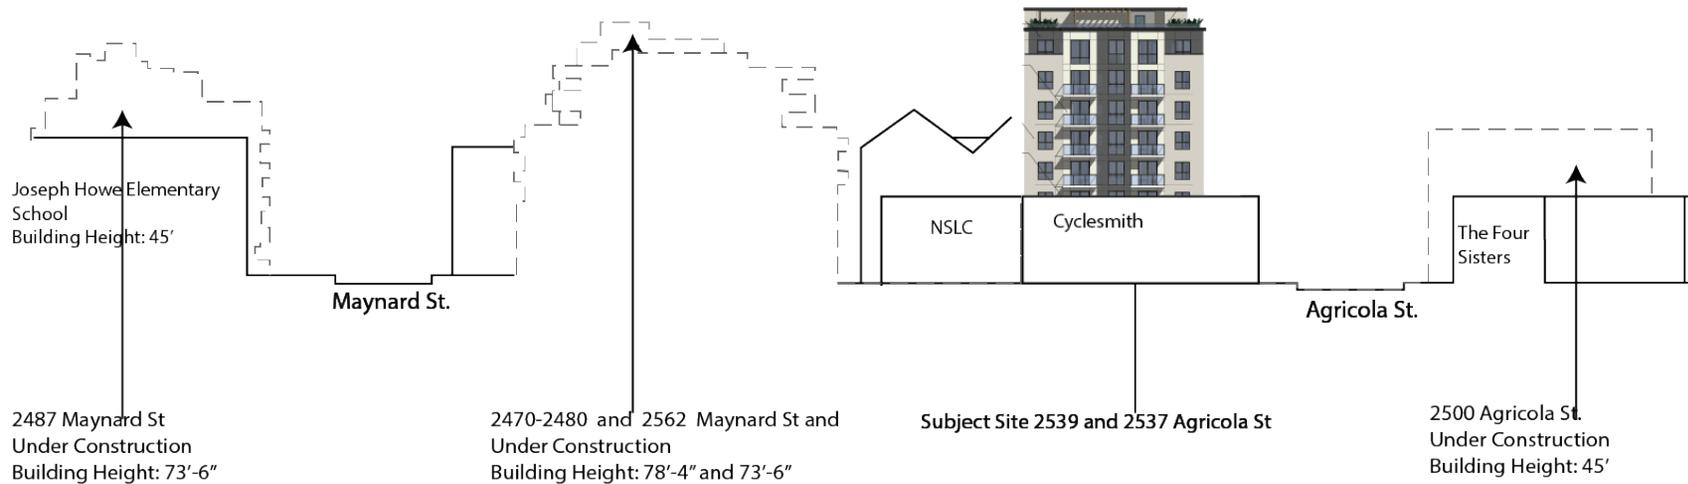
Showing Current Construction adjacent to 2539 Agricola Street
